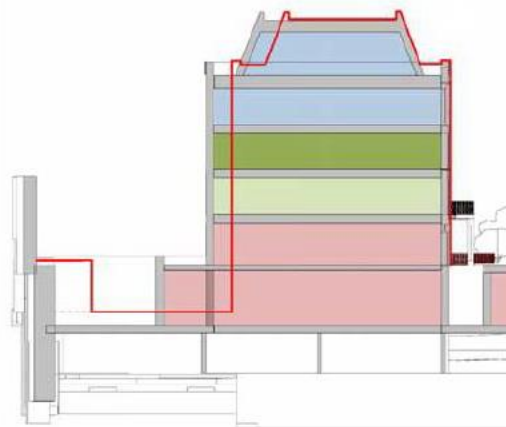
Proposed section, showing the lower ground floor extension to Block 4. The red line shows the Consented Development profile of Block 4.
